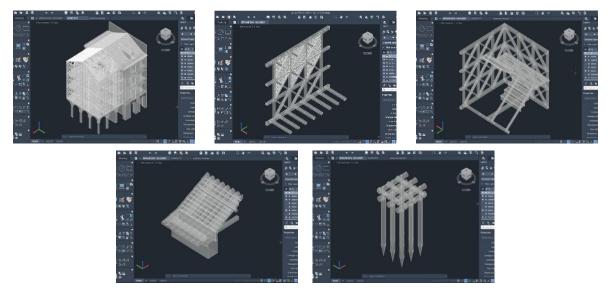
Complete modeling of the 1:50 scale model (upper left corner) and of the 1:10 scale models: *frontal*, stairs, eaves and foundation piles, respectively.
